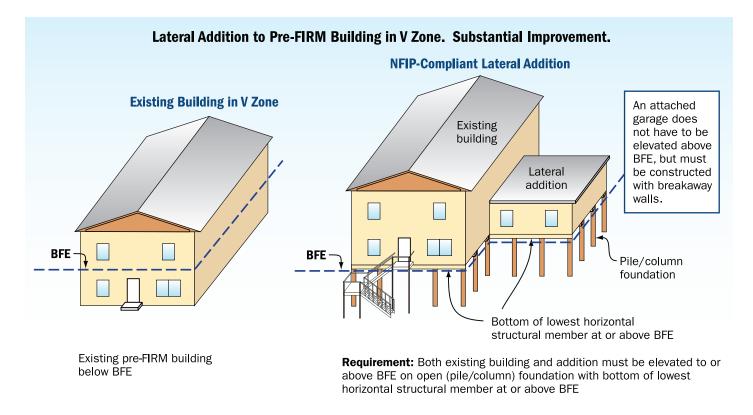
Substantial improvement: Lateral addition to a pre-FIRM building in a V zone.
